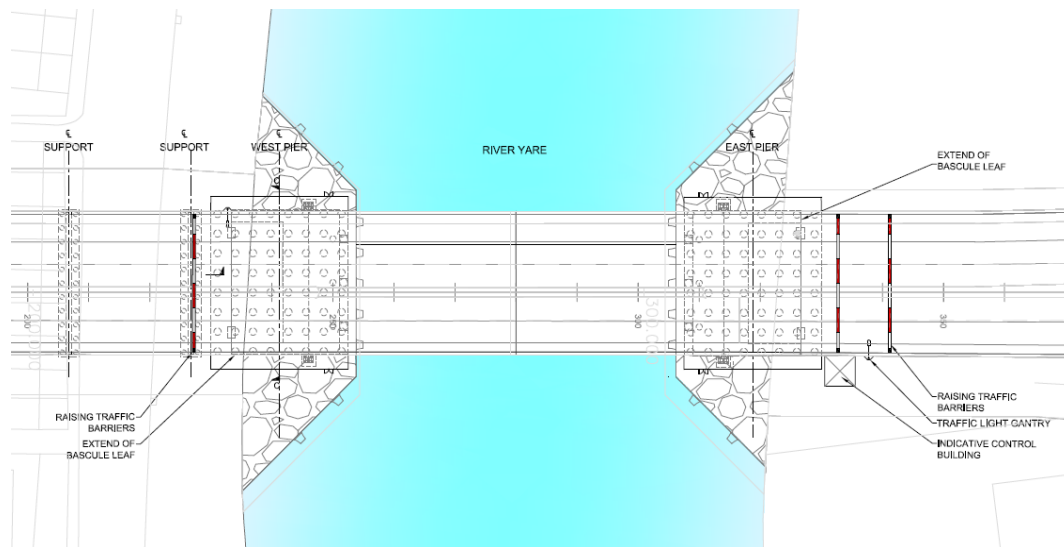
Plan of the bridge showing the Knuckle walls with fendering steel system (Mouchel/WSP, 2017)
